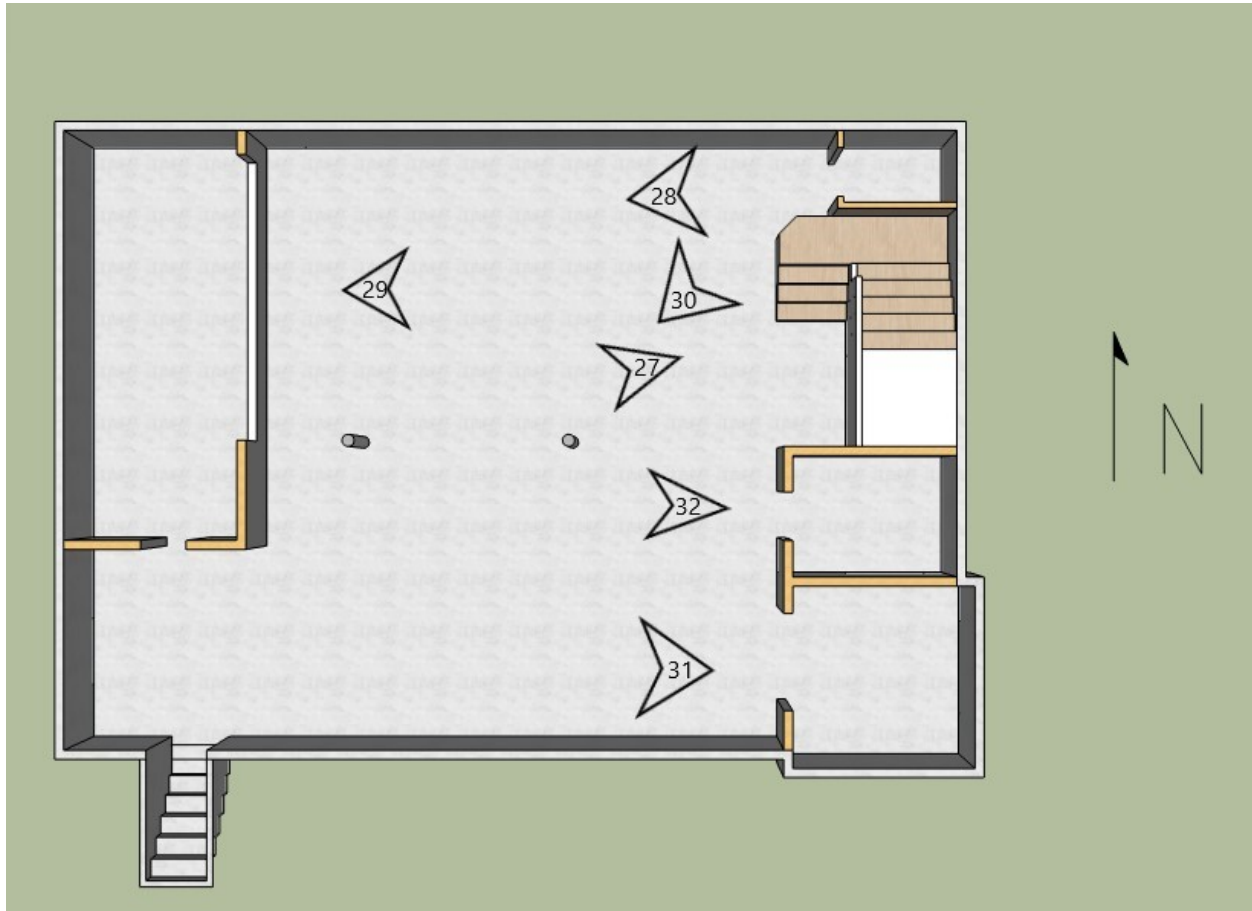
Floor plan and photo log of the Second Baptist Church Basement. Not to scale
